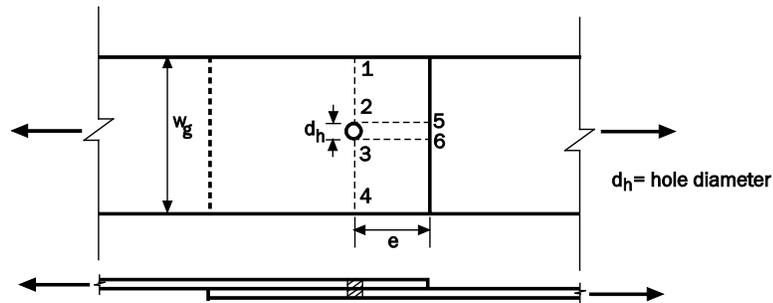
Potential Failure Paths of Single Lap Joint
